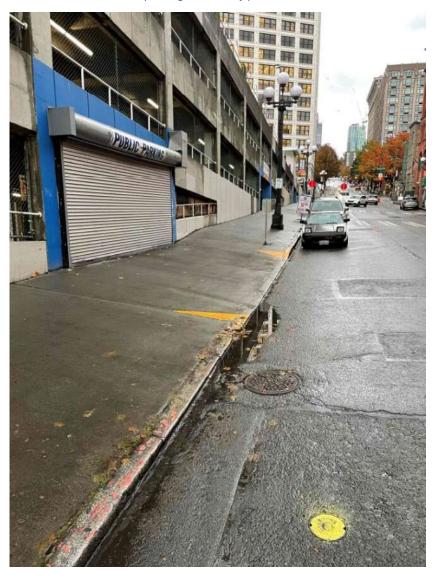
Yesler Way between 1st Ave and James St. The protected bike lane would be installed in the street adjacent to Pioneer Park. The existing signal will not be modified at this time; instead turn restrictions prohibiting right turns from westbound Yesler to northbound 1st Ave and left turns from eastbound Yesler to northbound James would be installed.
